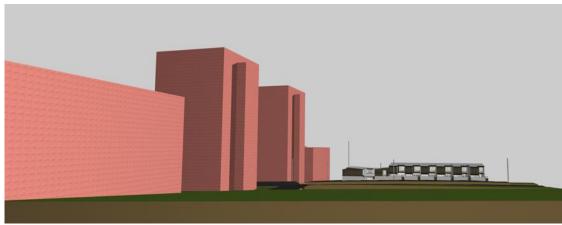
View looking westward along Dwyer Street showing reduced 2021 Scheme with a 46.8m tower height at 35-37, 41A Dwyer St, 372-374, 393-397 Mann St and 76 Hills St against the scale of proposed development on opposite side of Dwyer Street, near the intersection with Mann St. The subject proposal is at tower height 72.45m.
